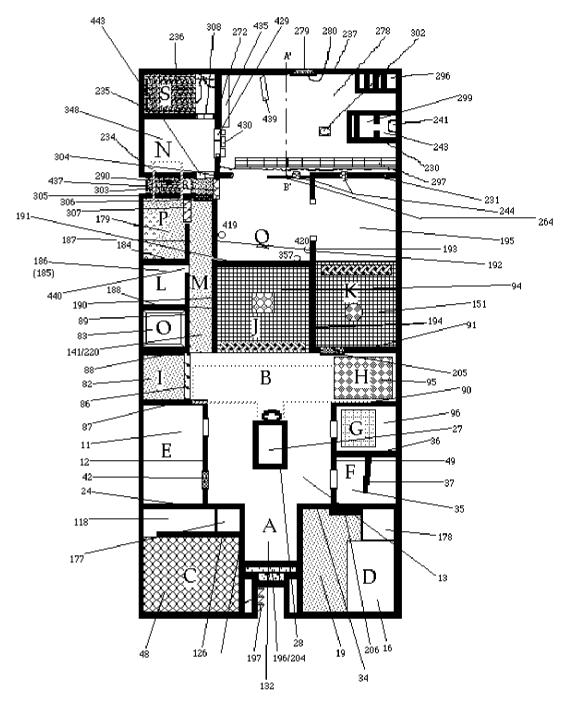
MacPaint 2.0 schematic plan of the House of Diana at Cosa, with the letters assigned to rooms and the context numbers assigned to walls and floors, ca. 1997. Plan by the author.
